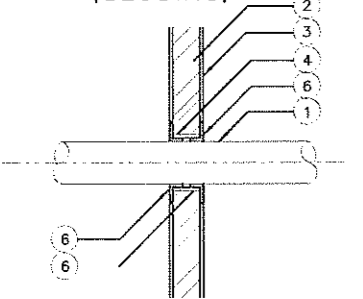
DETAIL SLEEVE THRU. FLOOR 2 (CLOSING)
